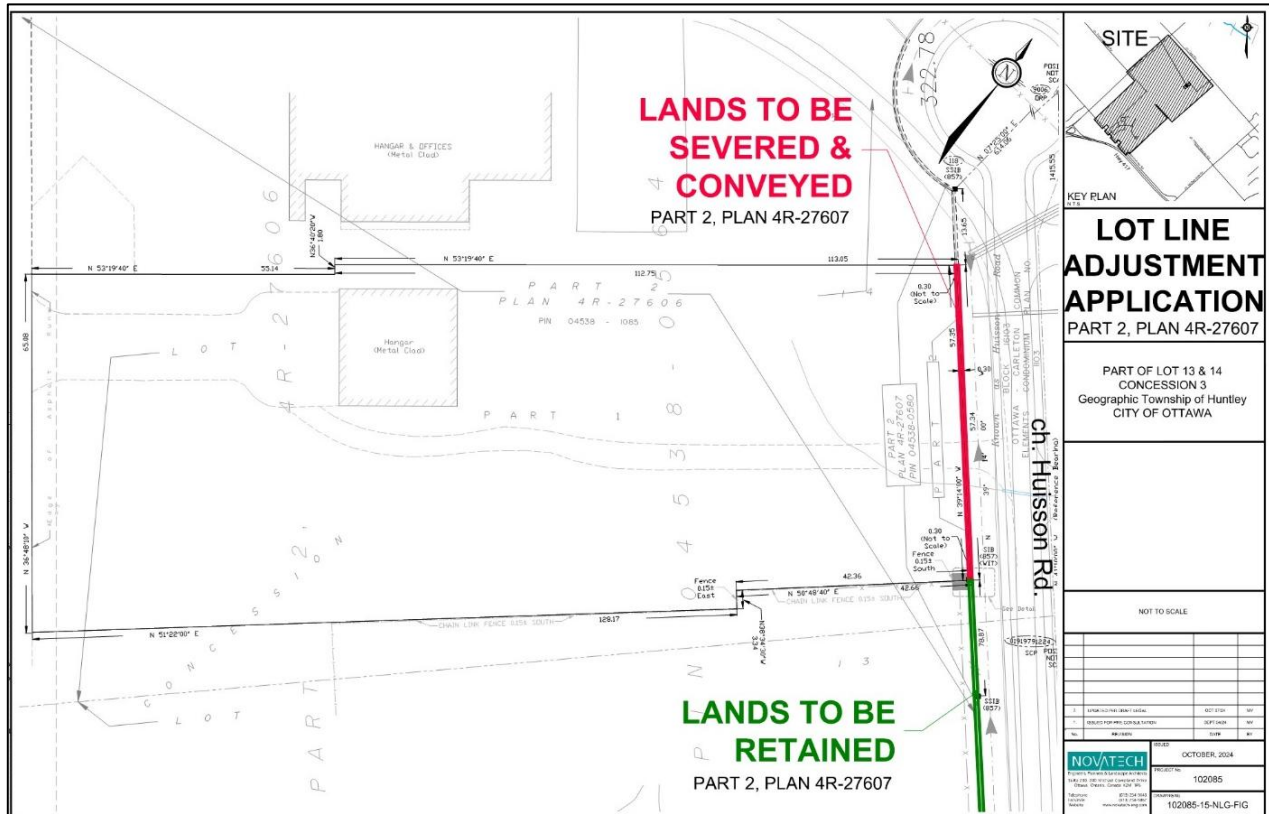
Excerpt of the Lot Line Adjustment Application Sketch for Part 2, Plan 4R-27607 prepared by Novatech dated October 7, 2024.
